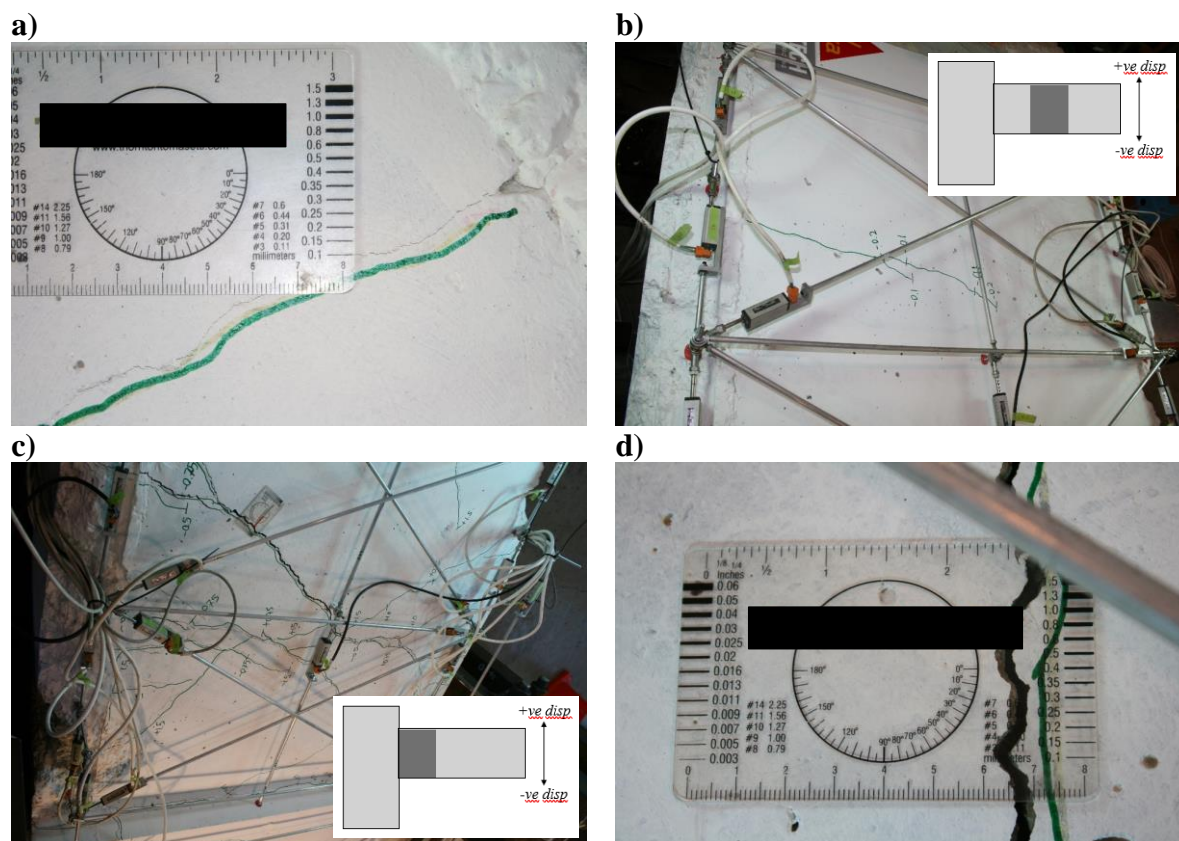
a) cracks 0.10 mm wide at 0.1% beam rotation; b) cracks developing outside the PHRD at 0.2% beam rotation; c) and d) cracks 4.0 mm wide at 1.5% beam rotation.
